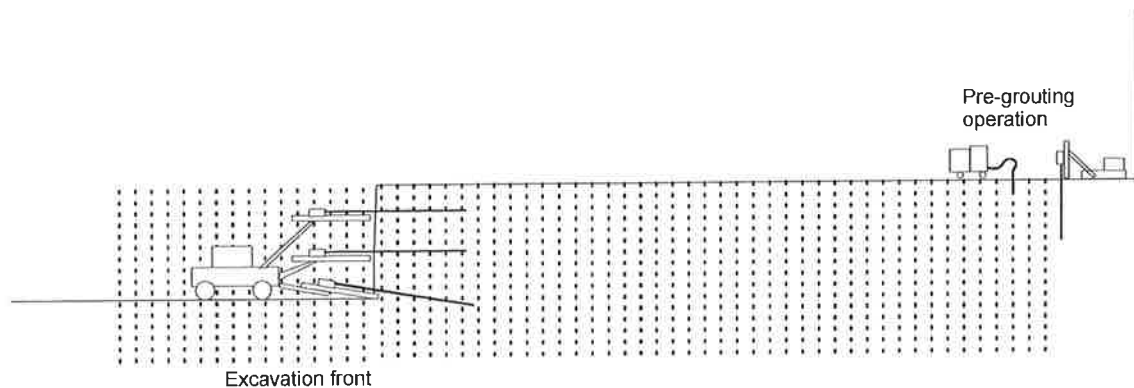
With vertical drilling for grouting, the excavation can be performed without interfering with the grout operation.
